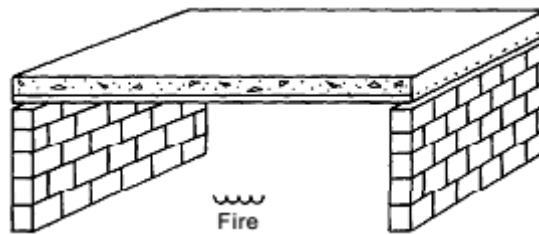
Simply supported reinforced concrete slab subjected to fire from below [1]
